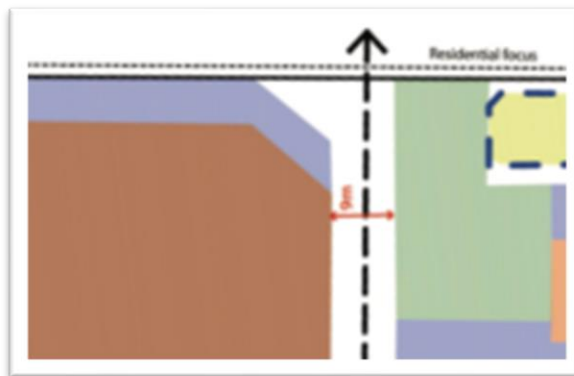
Building B layout in the IFP. Source: Schedule 15 to the DPO – Yarra Planning Scheme
